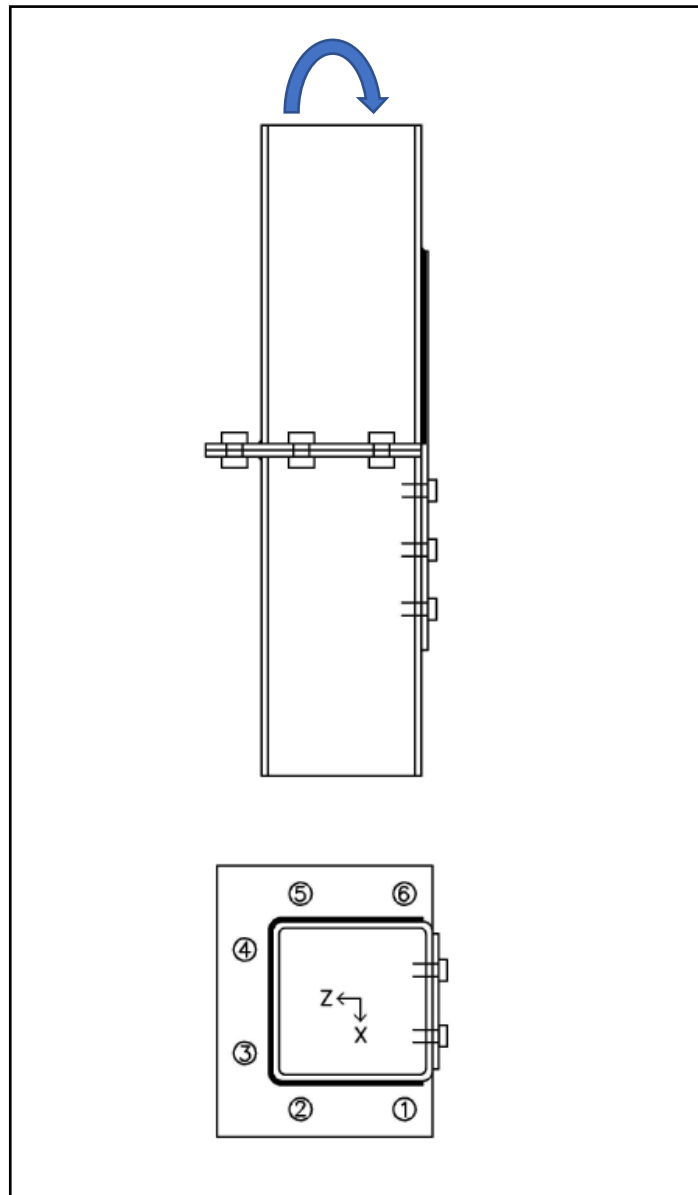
Plan and elevation of specimen IC-1 (case 1)
